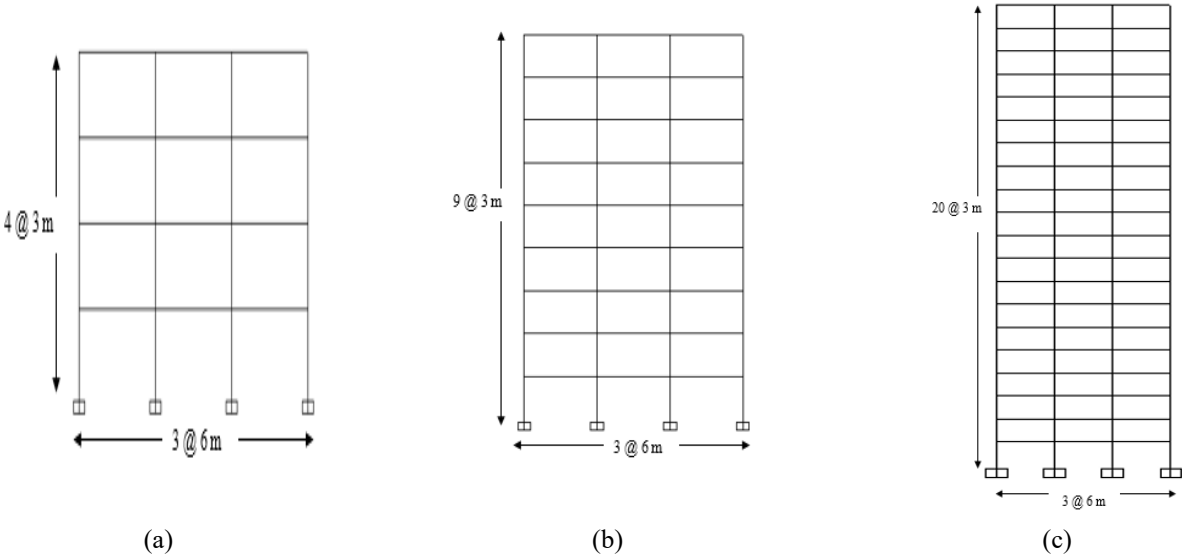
Elevation view of the frame buildings: a) 4-storey b) 9-storey c) 20-storey
